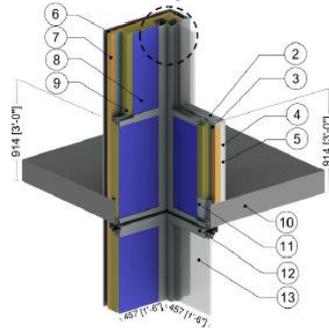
Window Wall System – Triple Glazed Insulated Frame at Slab Intersection with Improved Spandrel Bypass & No Interior Stud Cavity Insulation
